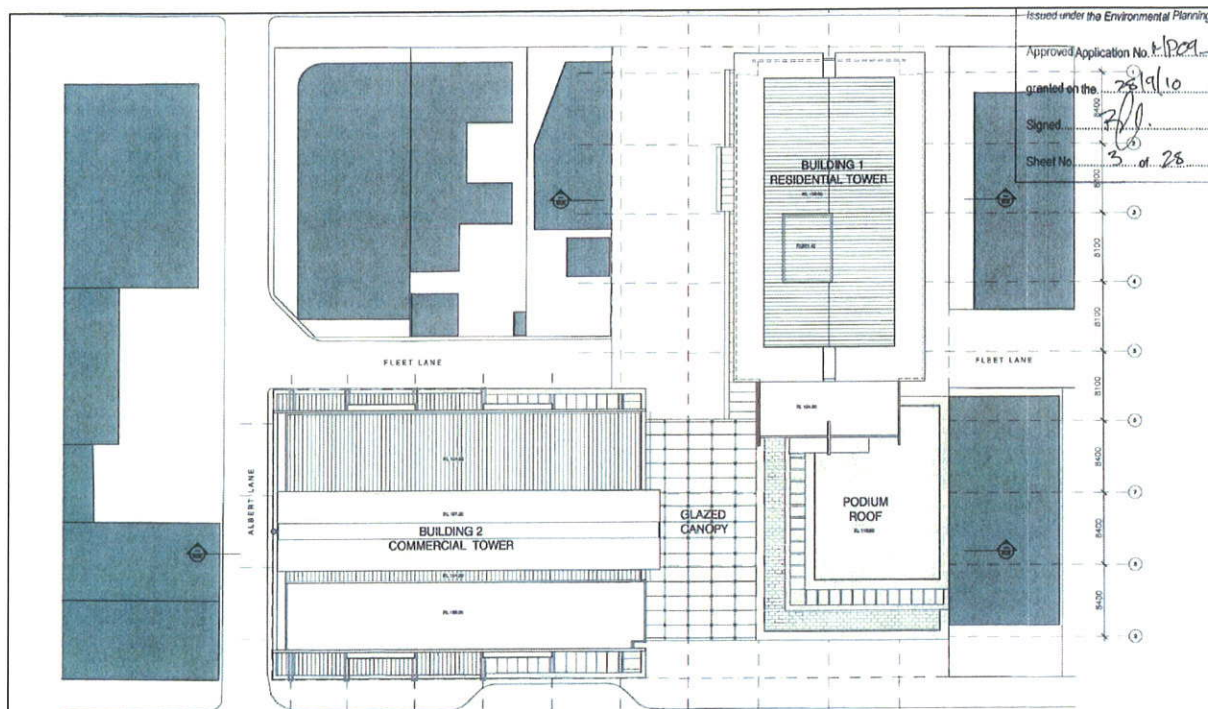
Approved Site Plan (Source: Proponent's PPR)
